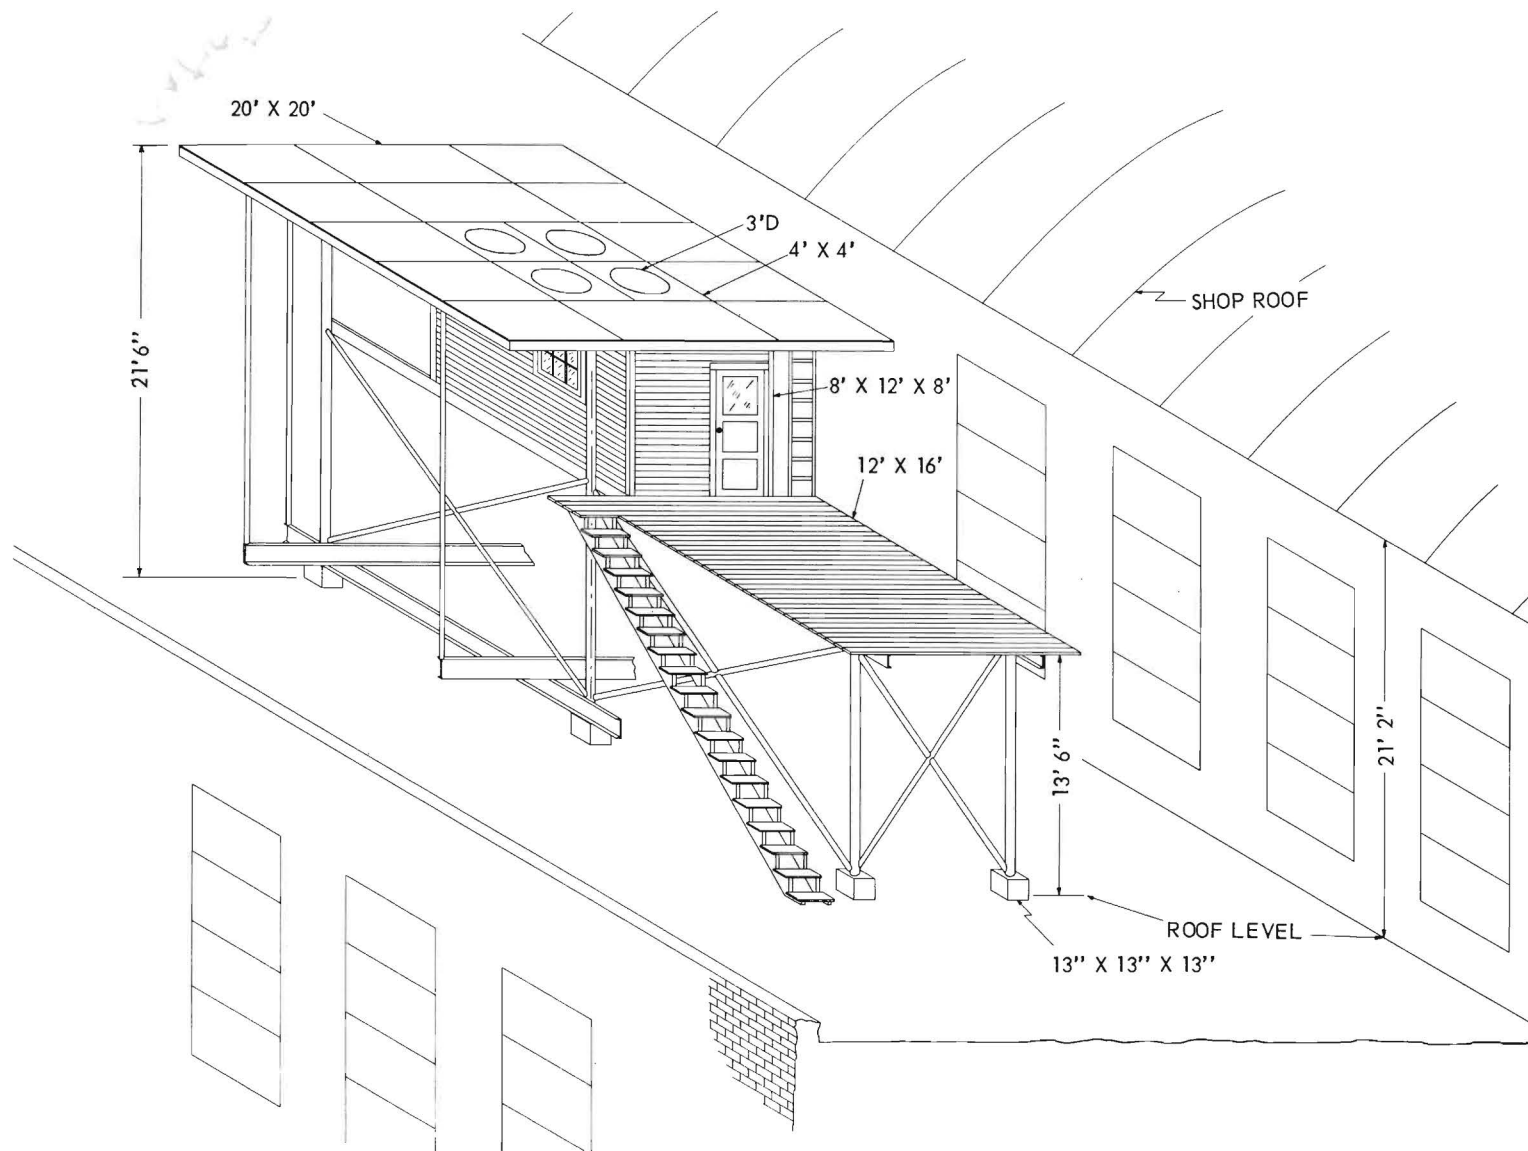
Proposed Combination Ground Plane-Microwave Range Facility.
